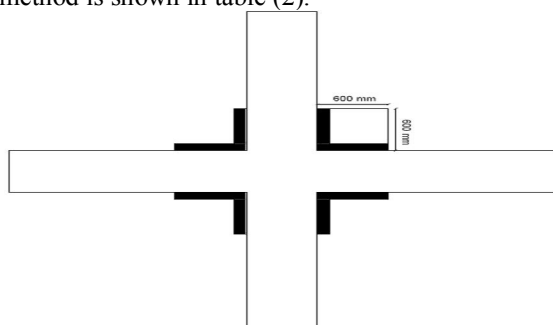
specimen of C_1 - C_2 intermediate strengthened joints before and after beam and column wrapping
